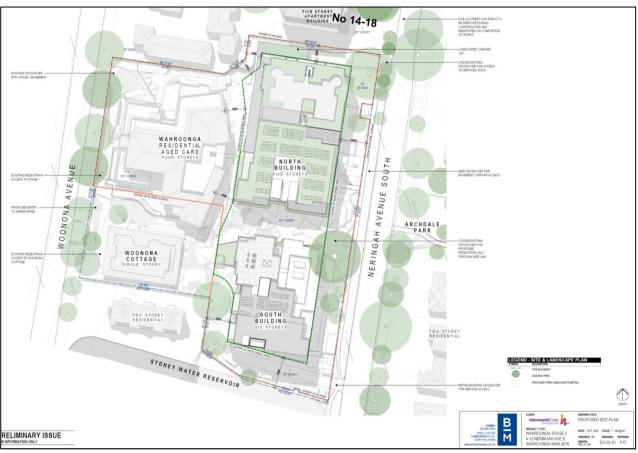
Proposed Site Plan with No 14-18 Neringah site notated Source: Bickerton Masters
